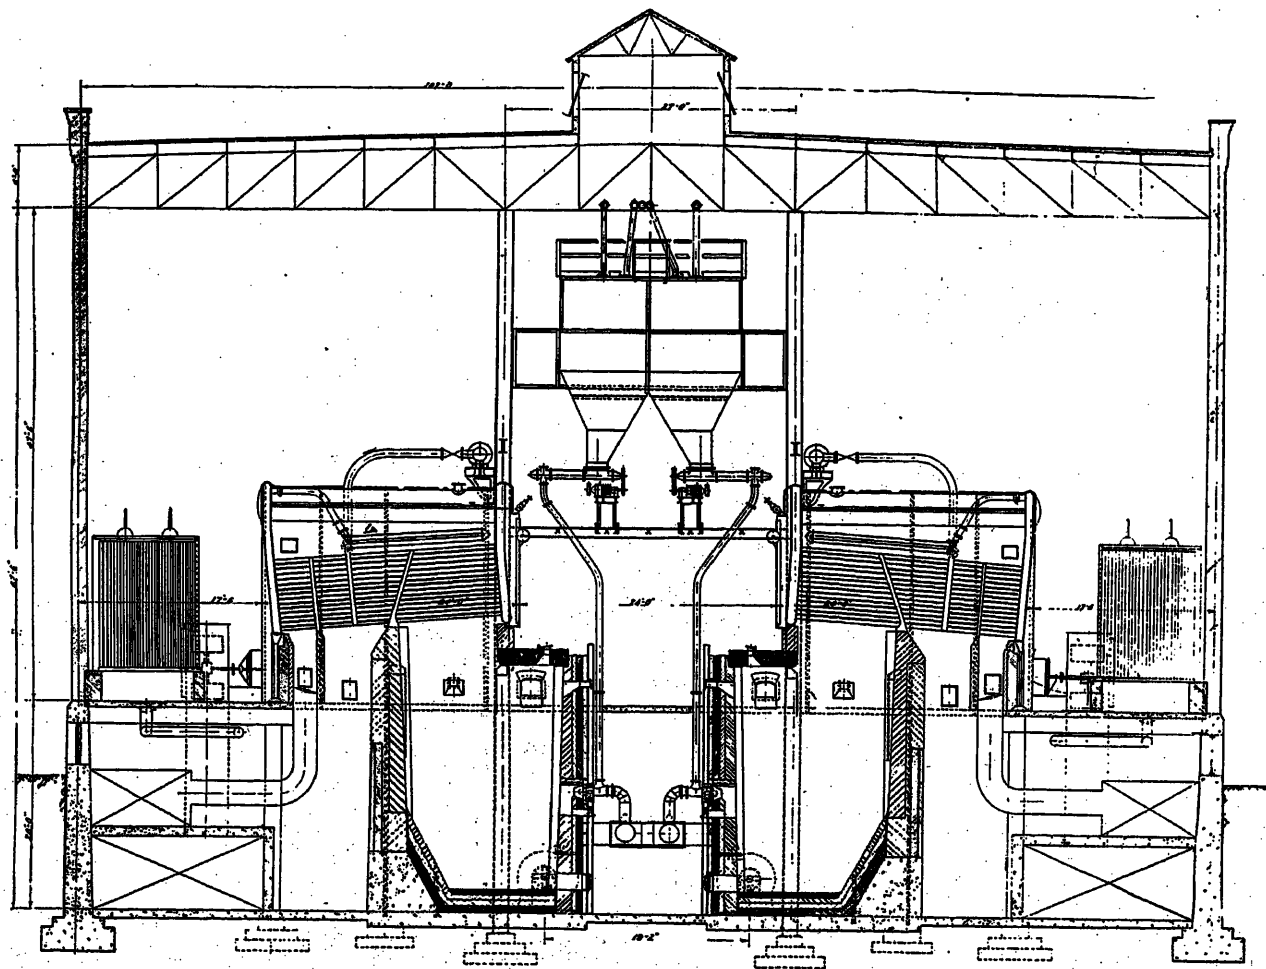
CROSS-SECTIONAL VIEW OF TWO 1308-H.P. EDGEMOOR BOILERS
